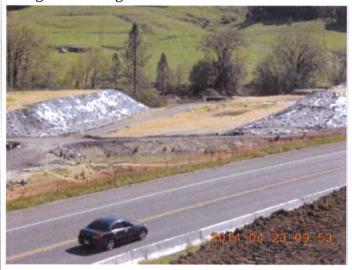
A view of the drain inlet mentioned in Photo 16. A view of the stormwater basin mentioned in Photo 18
